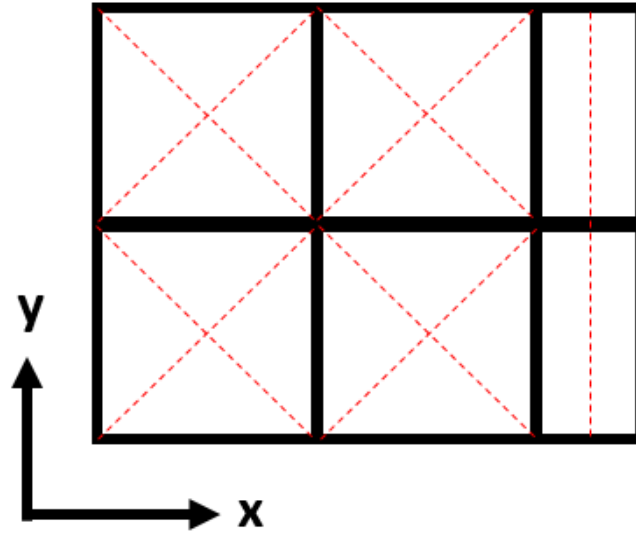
Tributary areas of beams supporting concrete slab roof
